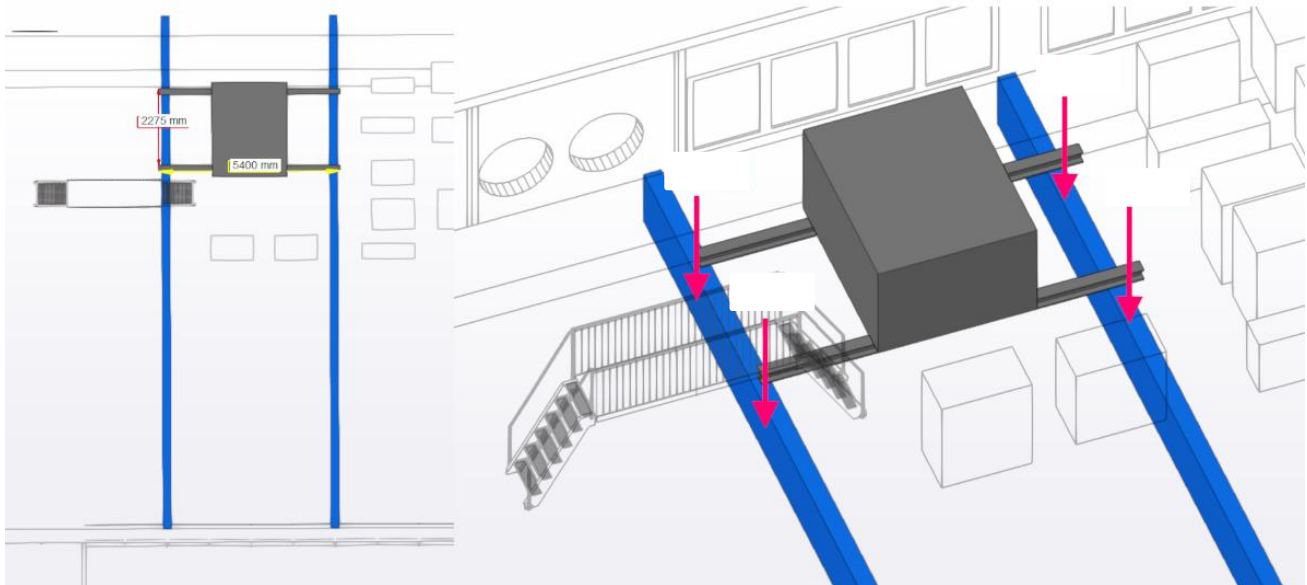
Plan and detailed view of the new cubic tank in Area 4 of the terrace.
